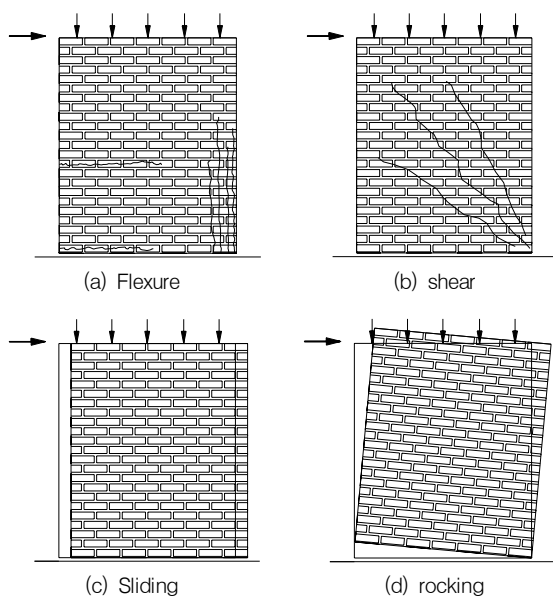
In-plane failure of the non-reinforced masonry structure
